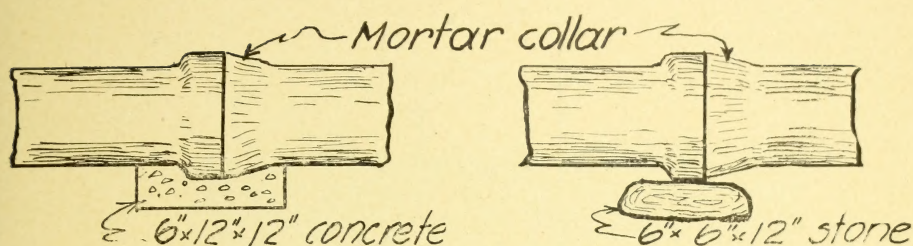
A support should be used under the joints of a pipe culvert in soft ground.
